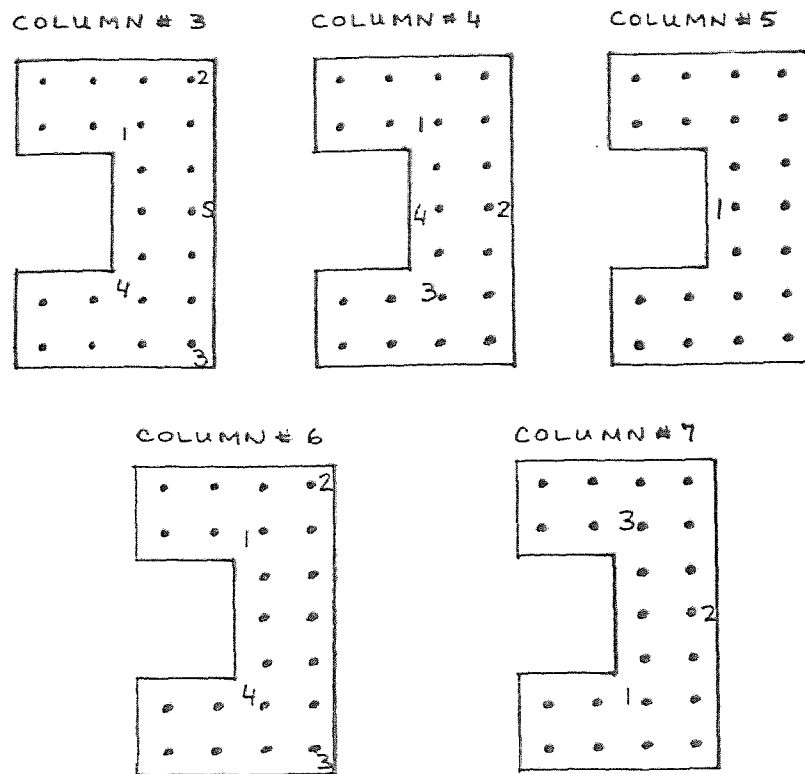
STRAIN GAUGE ARRANGEMENT IN STEEL REINFORCEMENT
